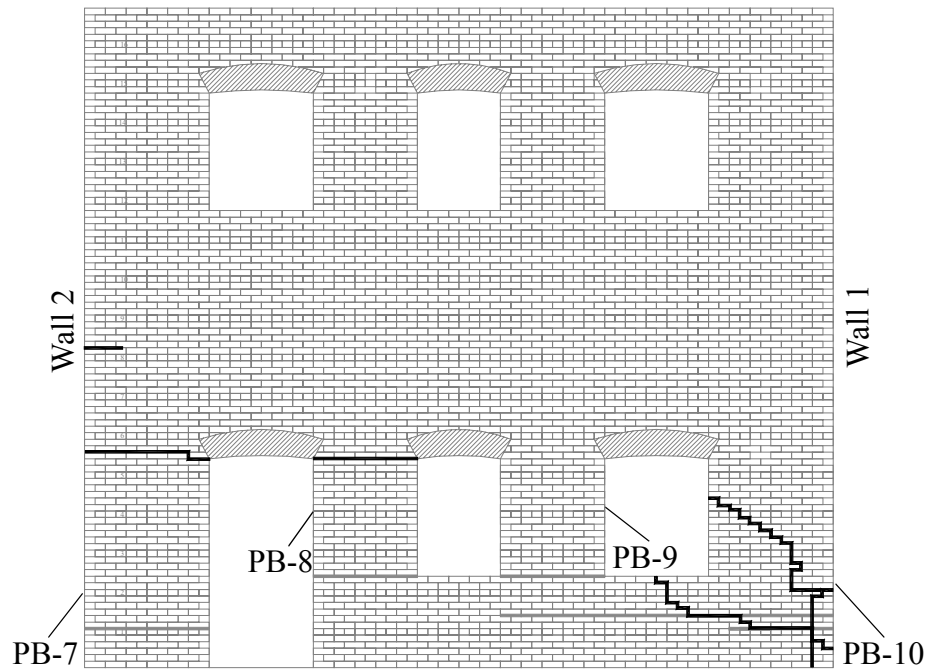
Crack pattern in Wall B following Test Run 19.
